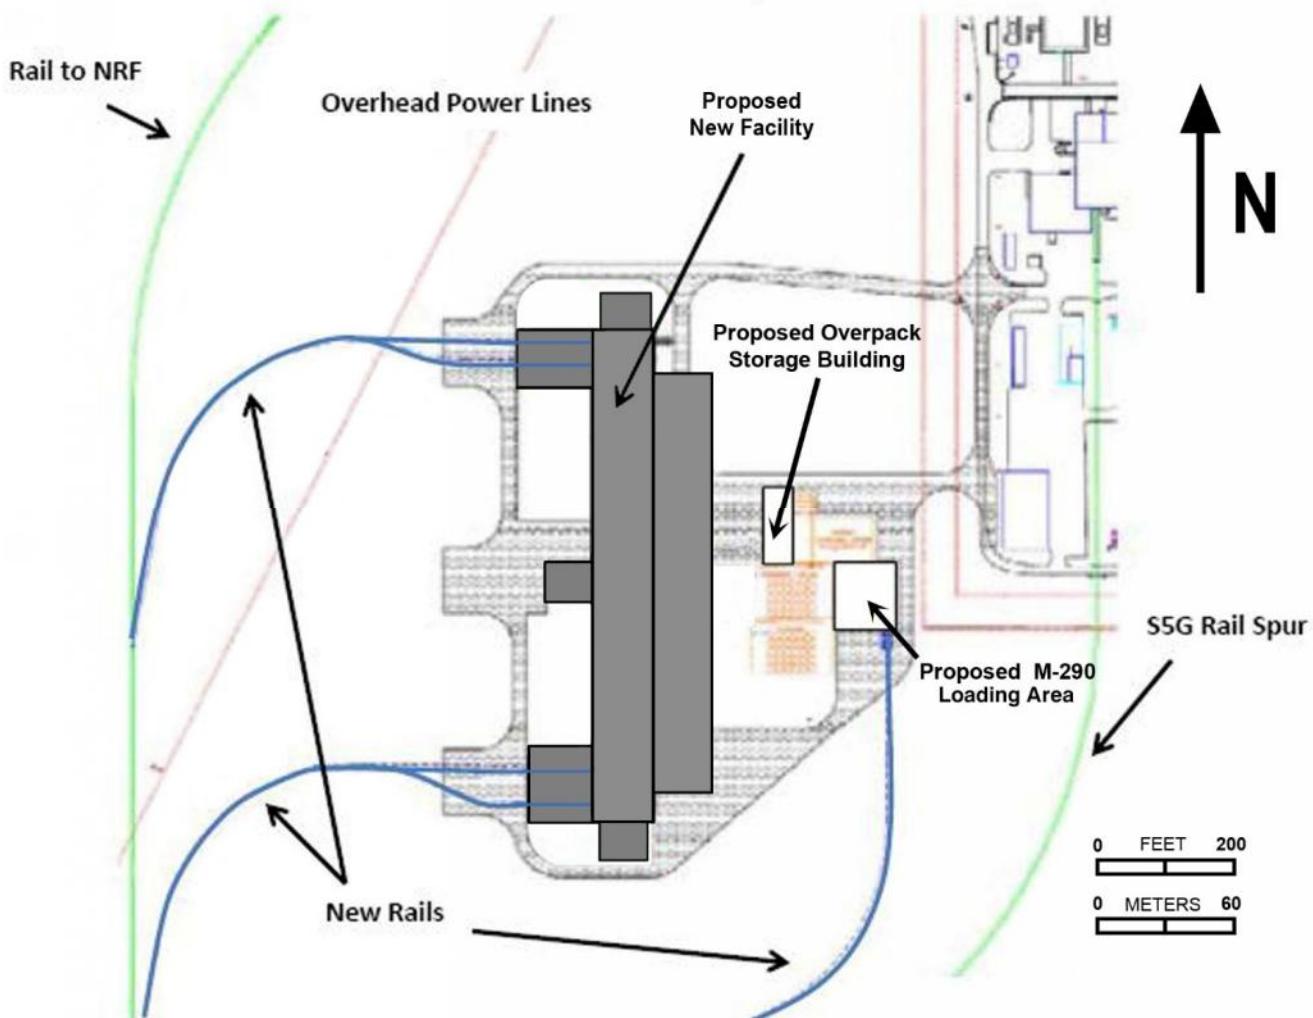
Conceptual Rail Line for the New Facility Alternative at Location 6
